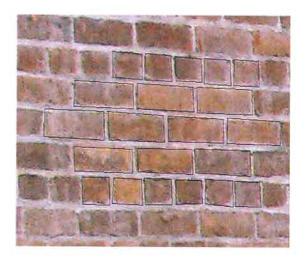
The brick pattern on the stack wall and the corner building wall is predominantly a 3-layer running bond with stretcher blocks, bounded by single courses of header bricks.
